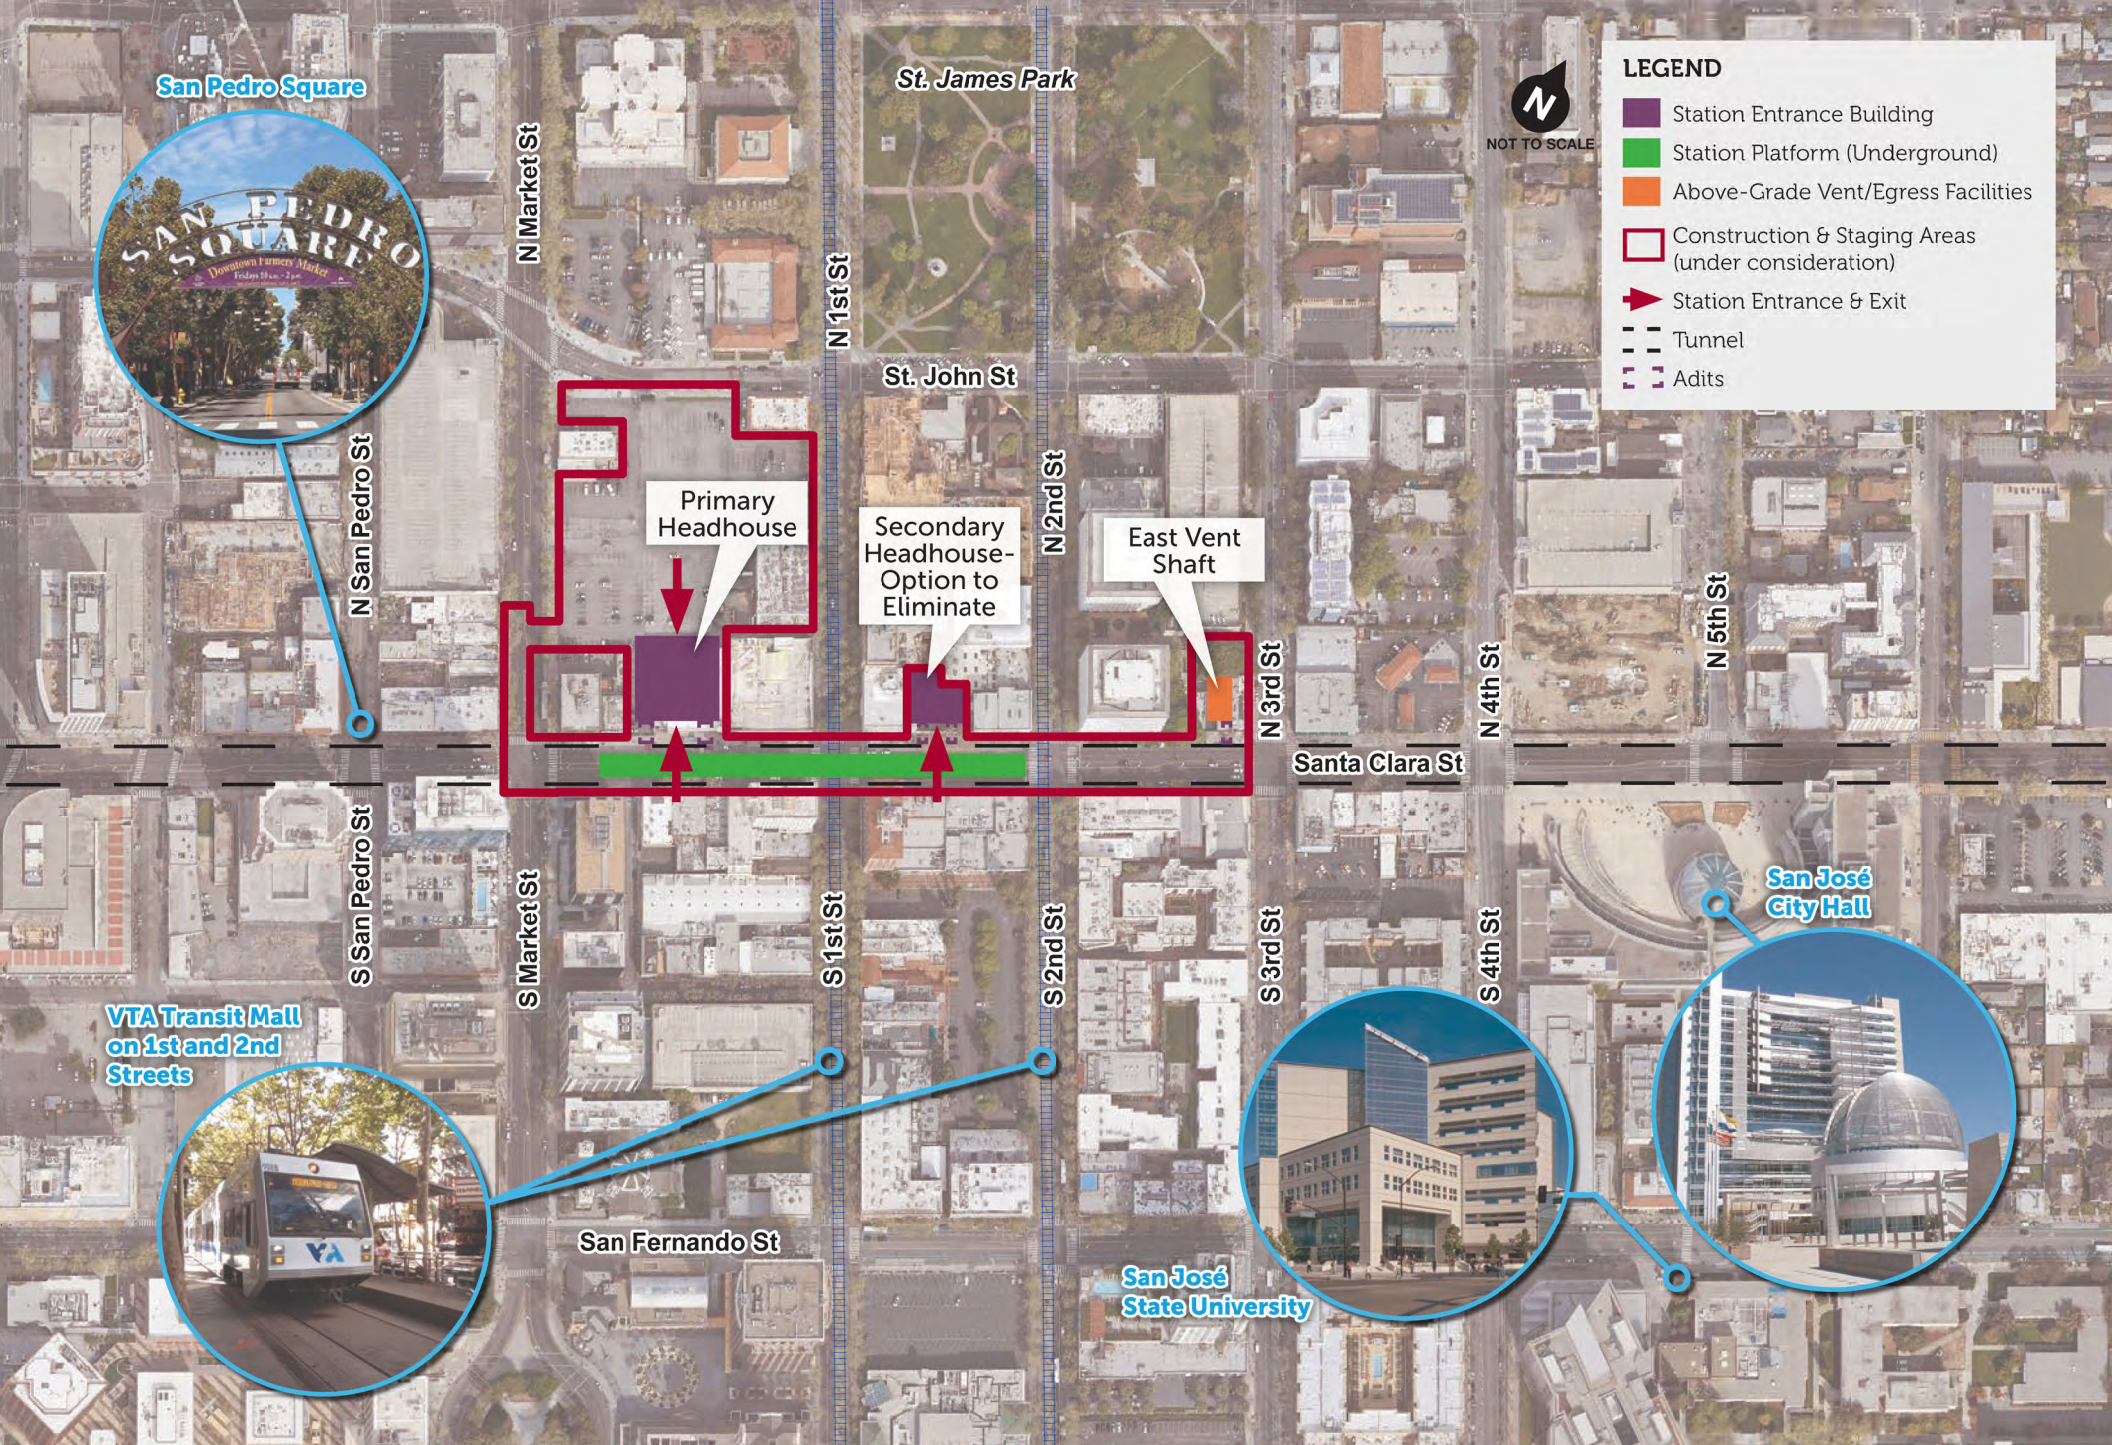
2024 Downtown San José Station Conceptual Site Plan
